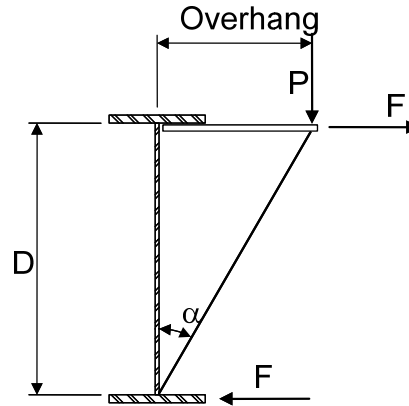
Bracket Bearing Directly on the Bottom Flange
